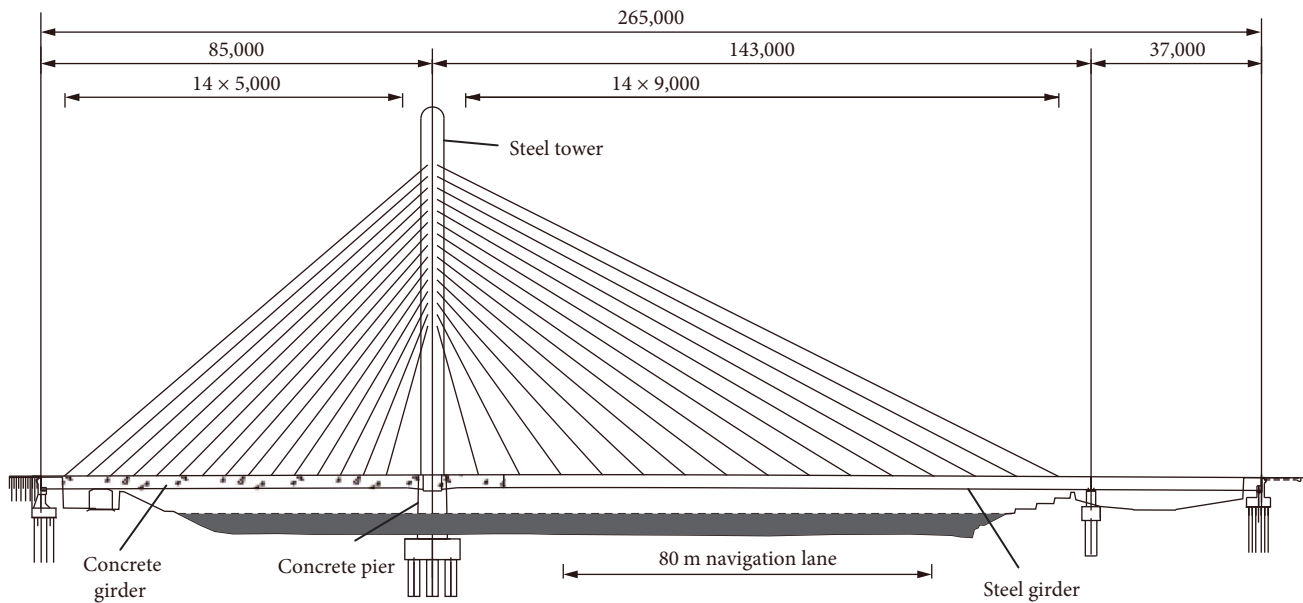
Elevation view of Jinwu Bridge (unit: mm).
